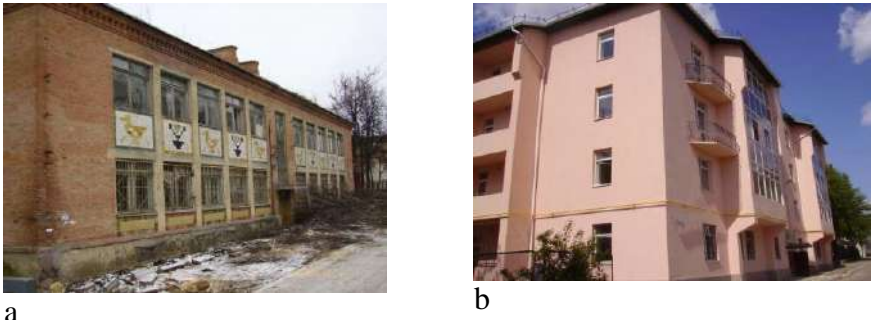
An object that has a two-story superstructure after strengthening the existing foundations with a base of soil-cement elements: a – a two-story building of a kindergarten before reconstruction; b – a four-story residential building after the superstructure
